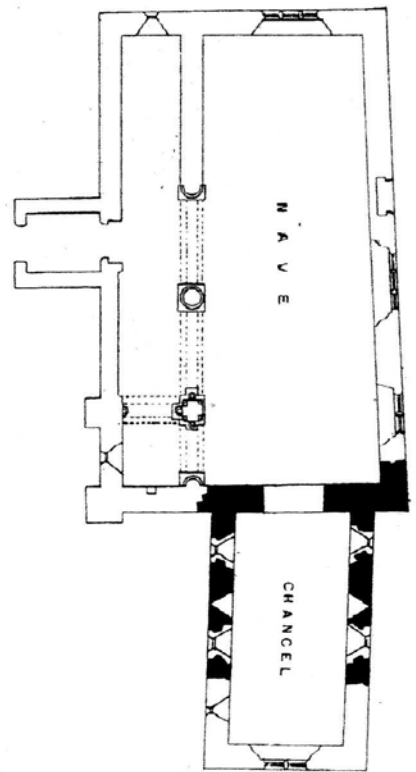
West Hampnett Church – Plan prior to 1867 Saxon – Norman work shown black (After Hills)
